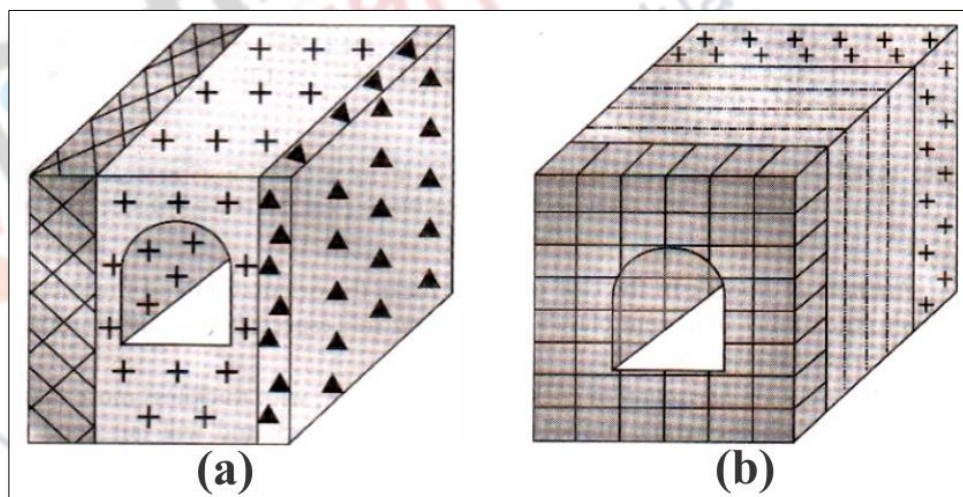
Tunnel through vertical rock. (a) Rocks striking parallel to tunnel alignment, thickness more than the tunnel span, one rock, throughout its length, a better condition in given situation. (b) Tunnels running across the strike will bring many different rocks along the tunnel length, not a very good condition.
